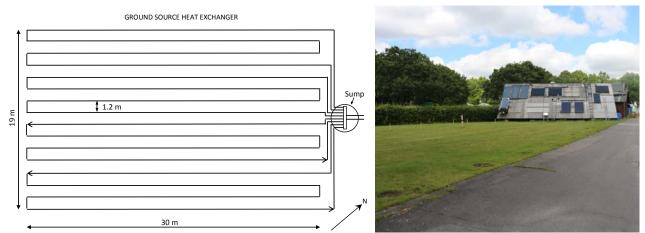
Layout of ground source heat exchanger and the location of the installation.
